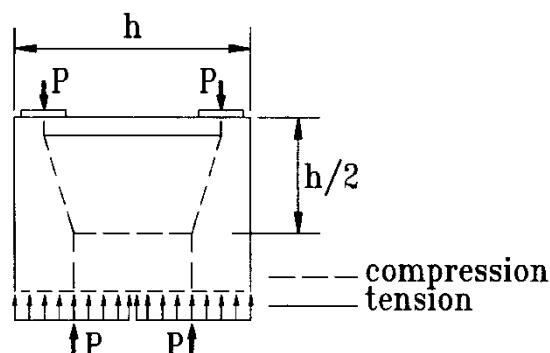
2—Path of Forces for Multiple Anchorages
